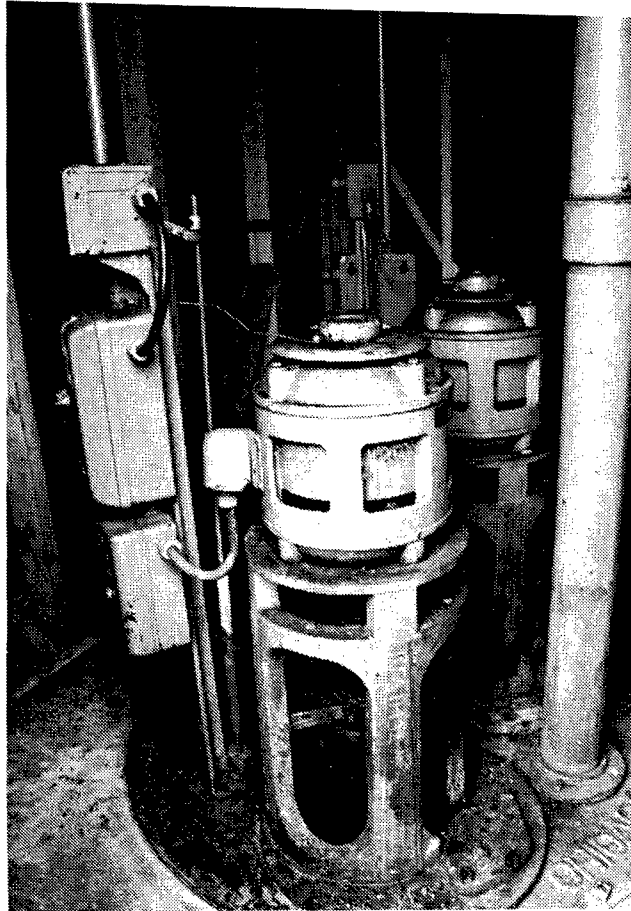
Building 710: Sewage pump manufactured by Chicago Pump Company.
